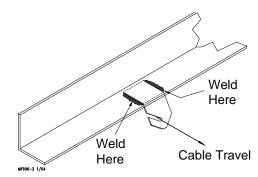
Welded Steel Truss Ceiling Bracket Installation
